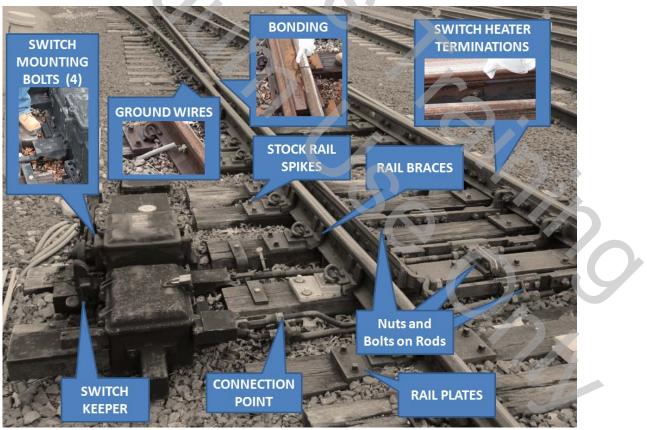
Switch Layout Highlighting Hardware to Inspect - Courtesy LIRR
